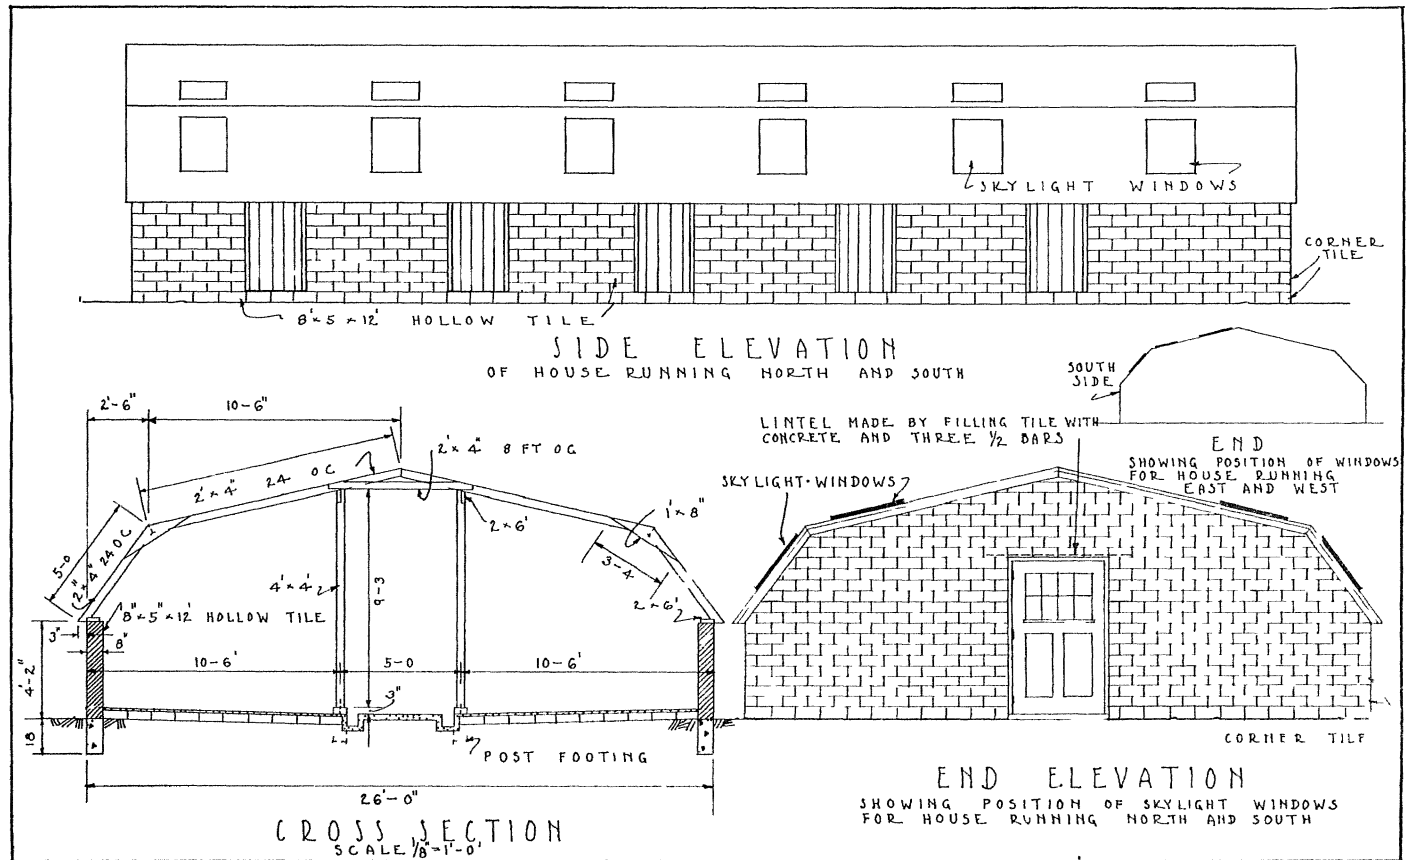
A gambrel roof hollow tile house. To make a complete set of drawings add Figs 10 and 13 Hog doors are similar to the hinge type in Fig. 12.
